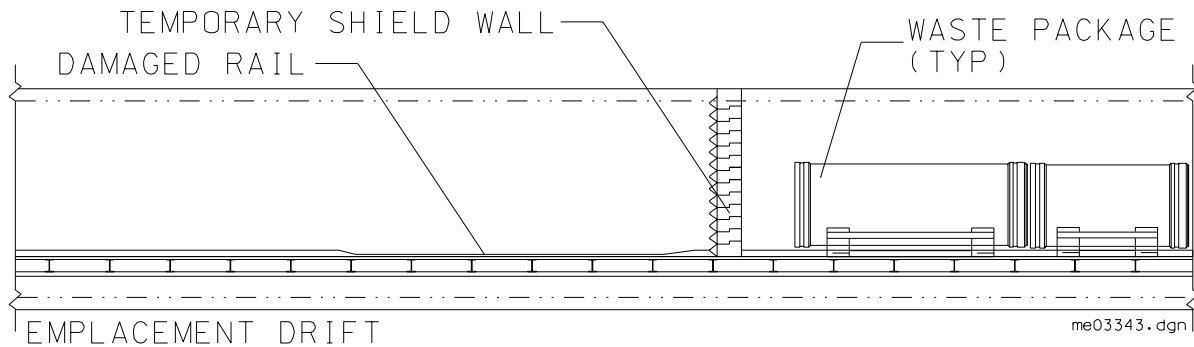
Fully Constructed Temporary Shield Wall in Emplacement Drift
